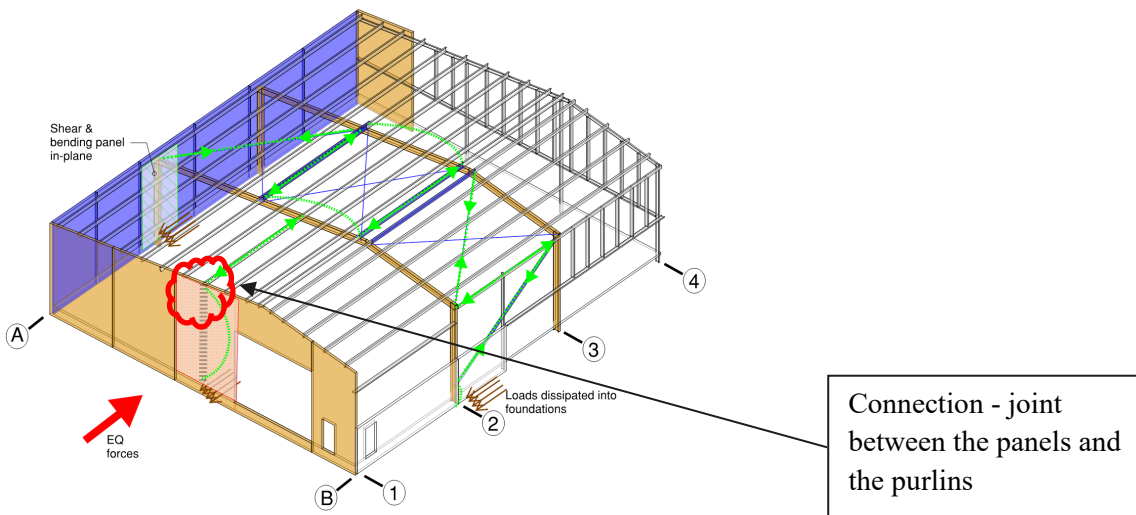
First connection for support of top portion of precast panels on Grid 1 out-of-plane
